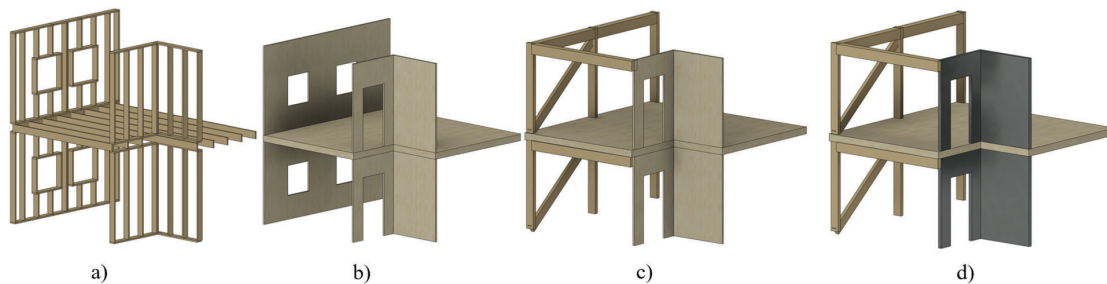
Visualization of different types of timber structures where a) shows an LFT structure, b) a CLT structure, c) a GLT-framed structure, and d) a hybrid structure.
